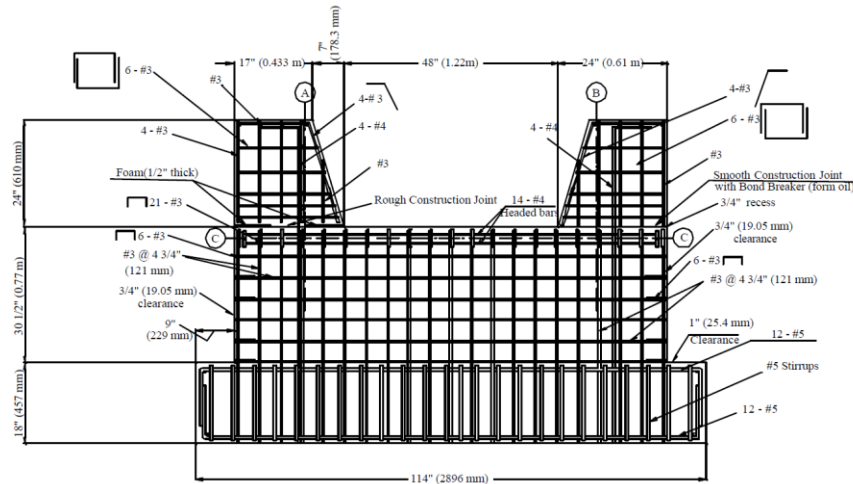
Elevation view of design details for Specimen 5 (from Borzozgadeh et al., 2006)
